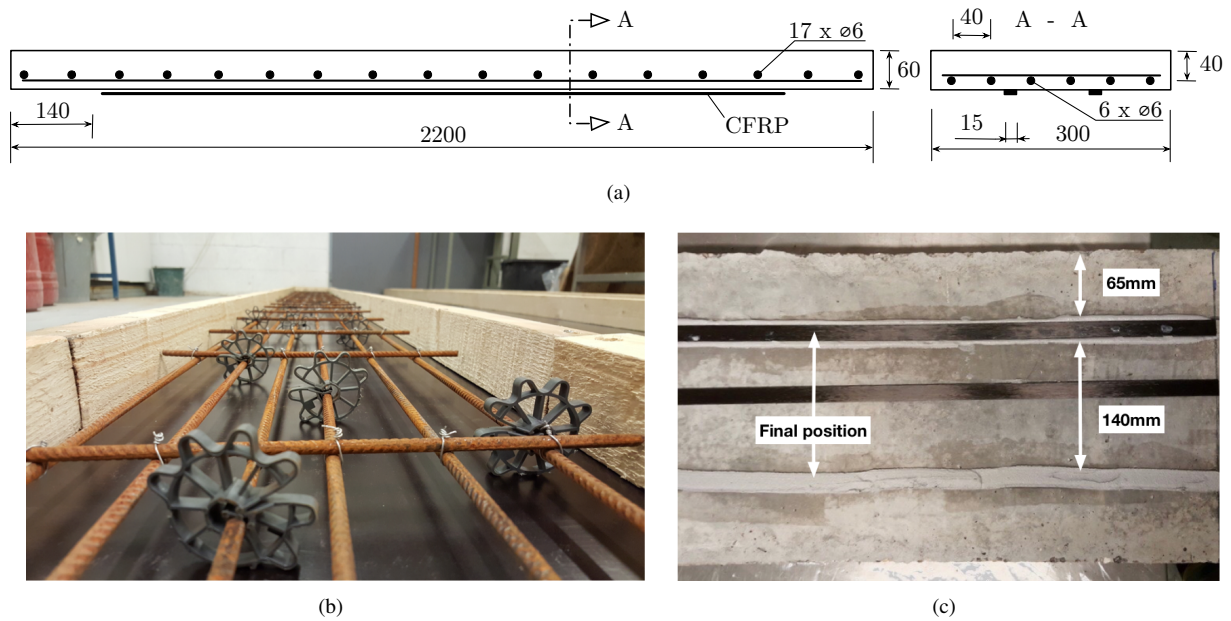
(a) Dimensions and reinforcement details of the tested slabs, (b) positioning of the steel reinforcement before concrete pouring and (c) top view of the slab showing the bonding process of the second CFRP strip.
